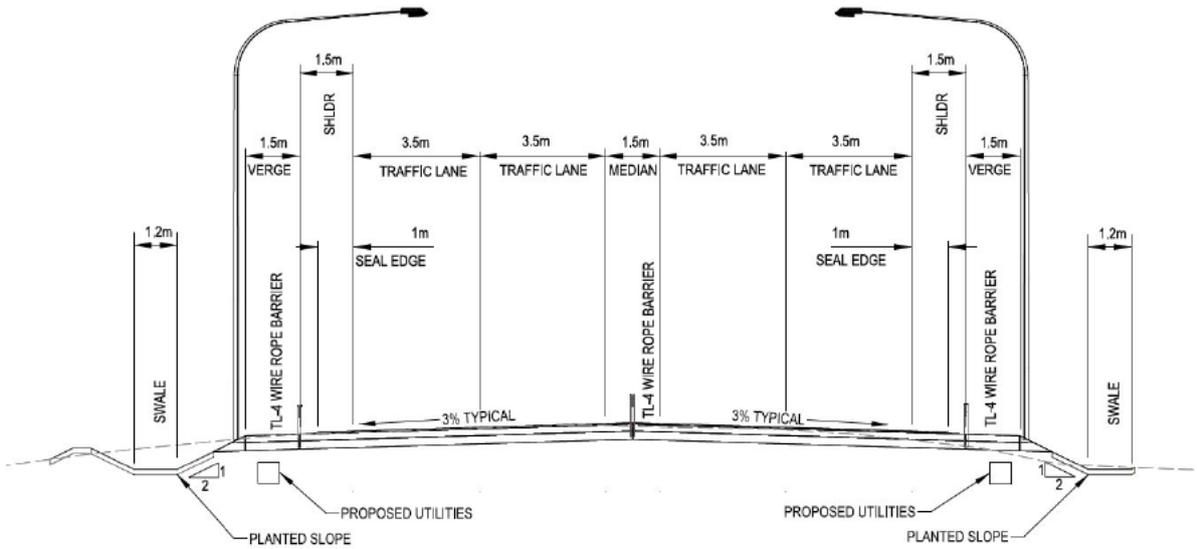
Typical Cross Section of SH1 Main Alignment
